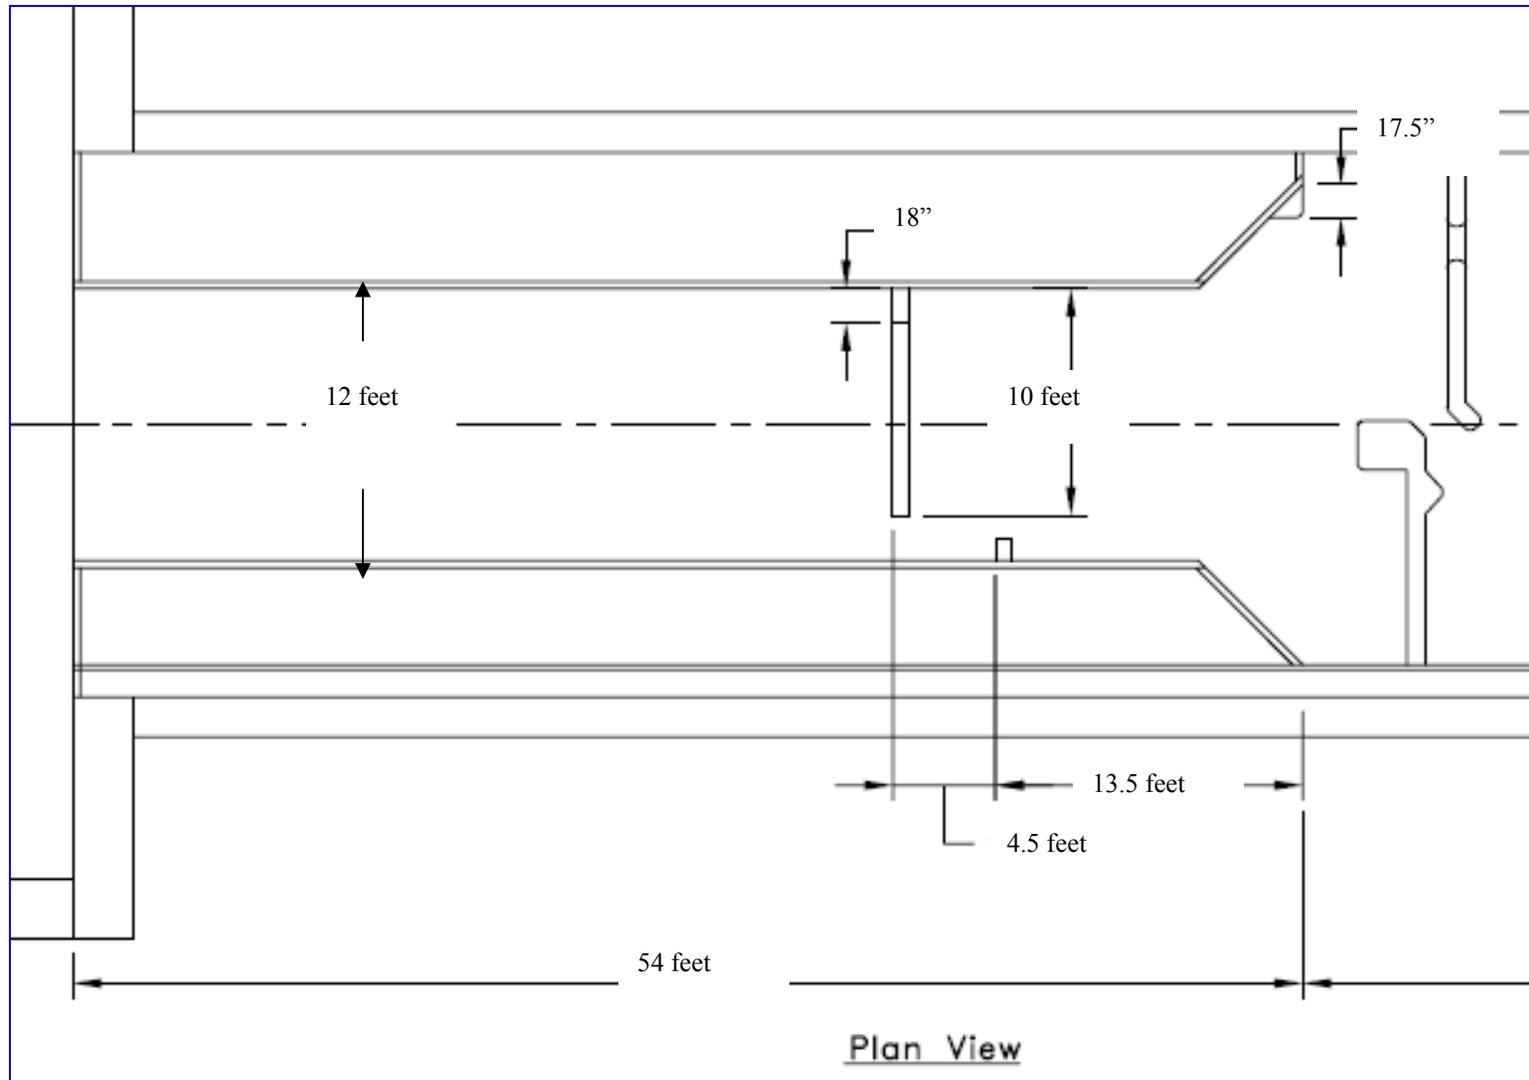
Exit Transition- Plan View --excerpt from model drawing provided by ENSR, modified to include prototype dimensions
